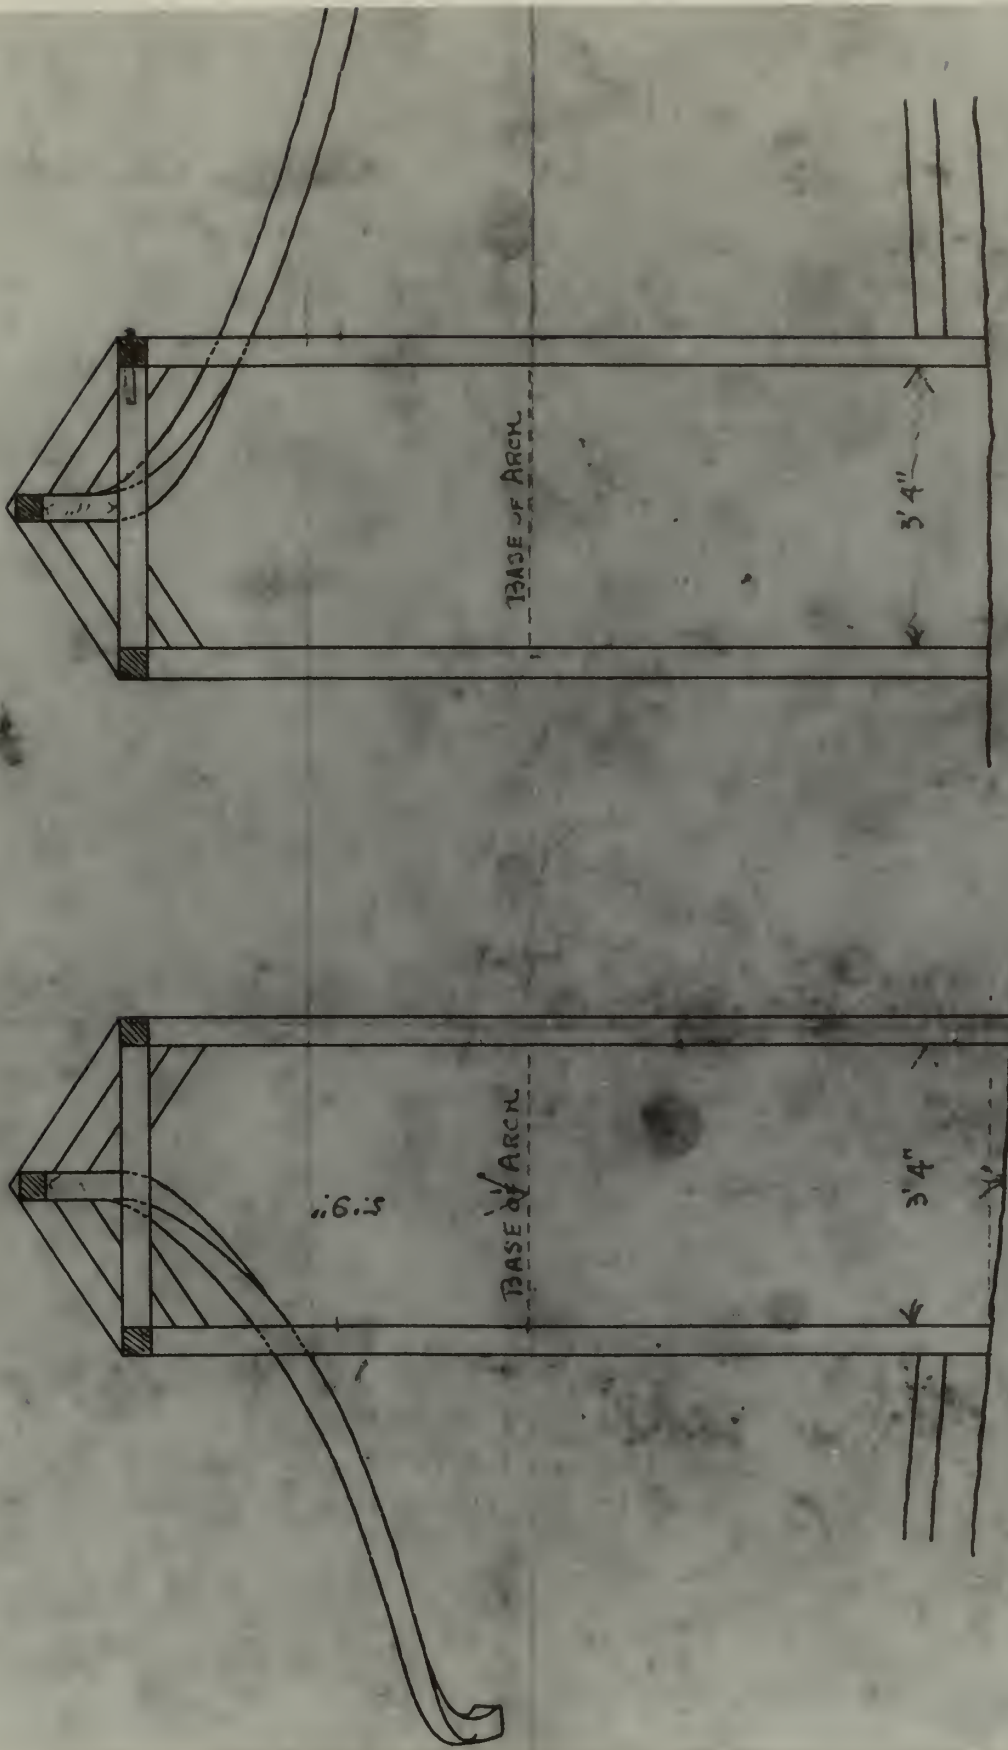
Spruce pole fence: elevation of front driveway arch, circa 1883.
